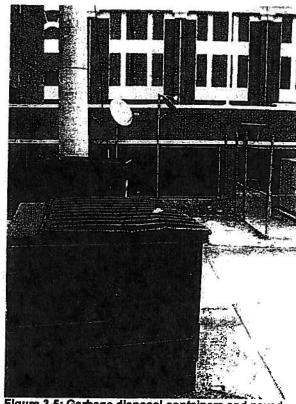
Garbage disposal containers and paved area of the drainage area
